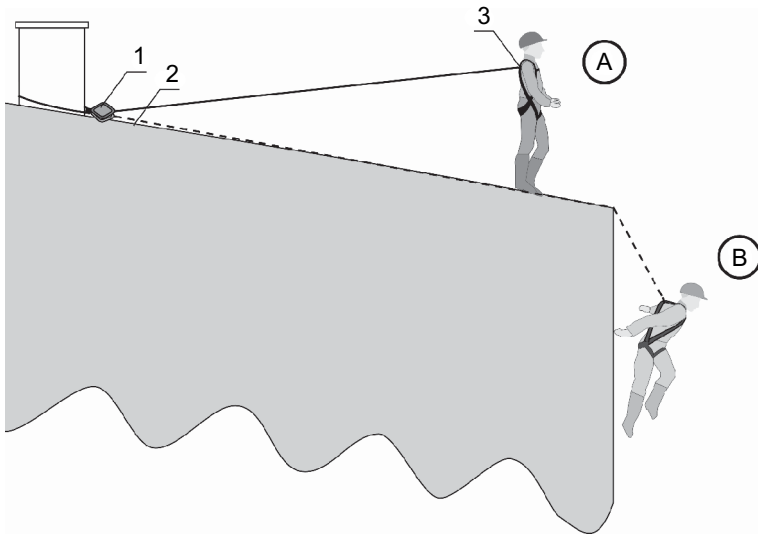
A retractable type fall arrester arranged horizontally—an example. Notes. A—position before fall, B—position after fall arrest, 1—retractable type fall arrester, 2—surface of roof, 3—person equipped with full body harness.
